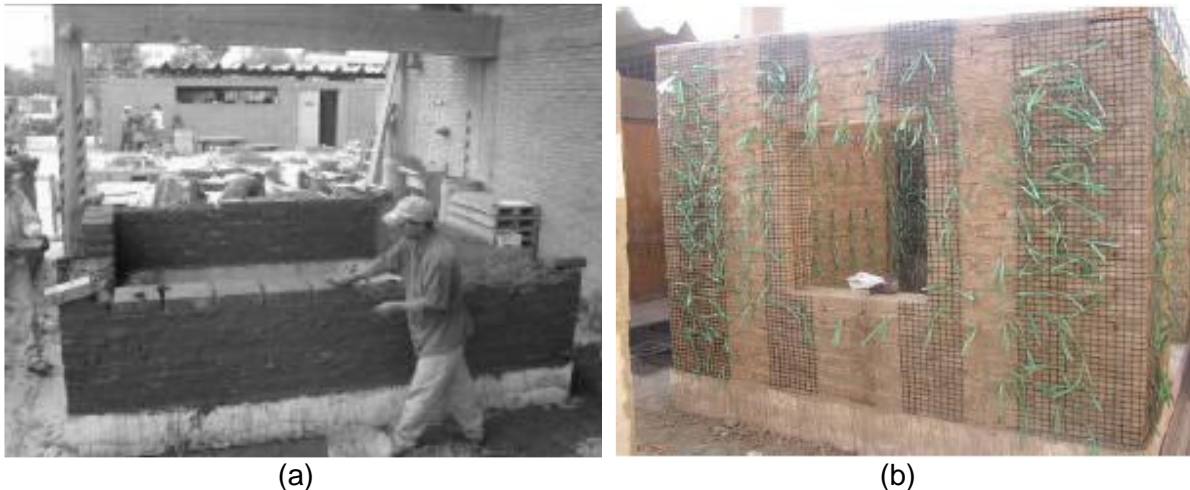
Construction of the real scale house models in the laboratory (a) unreinforced model and (b) external geogrid mesh reinforcement with 75% (Blondet, et al., 2006)
